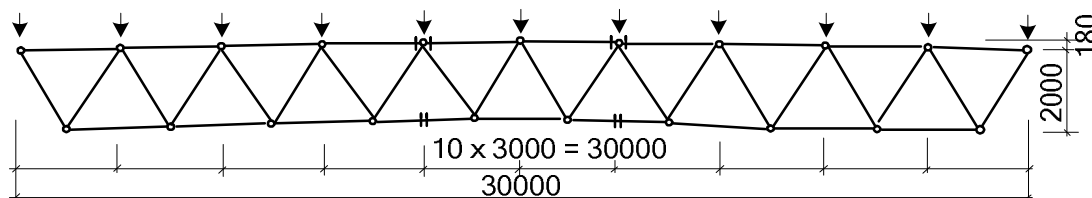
Scheme of a typical truss according to DSTU B V.2.6-74:2008 with a span of 30 m
